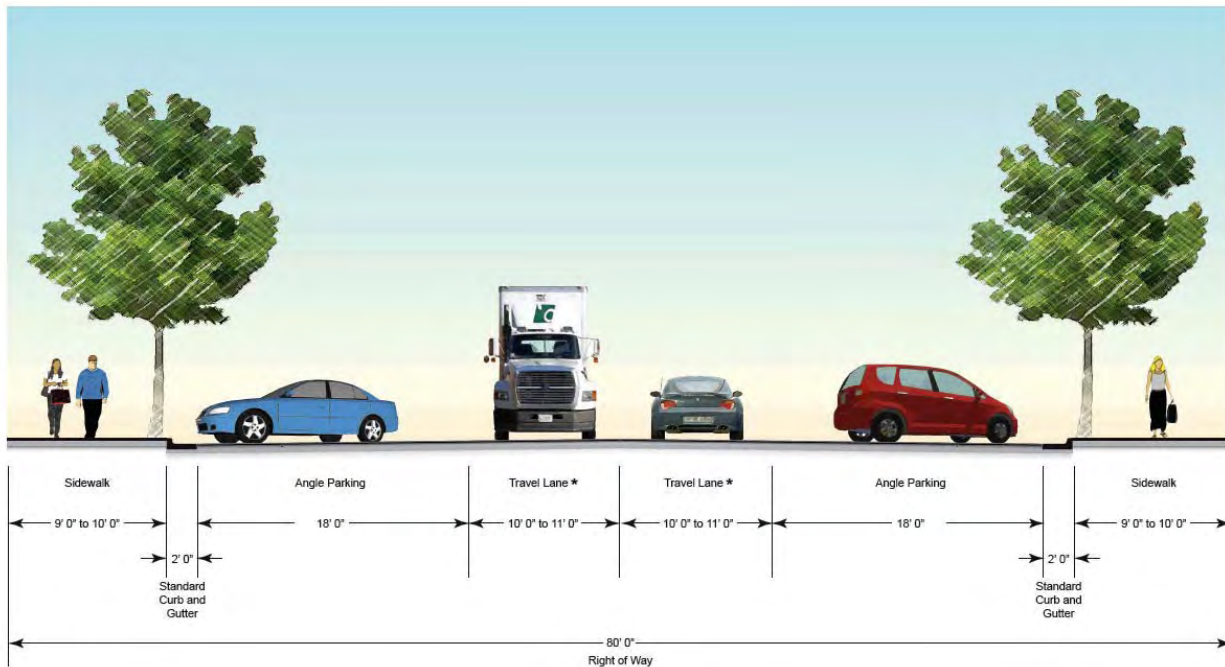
Street Cross Section with Angled Parking from McCall Area Comprehensive Plan (2007)
